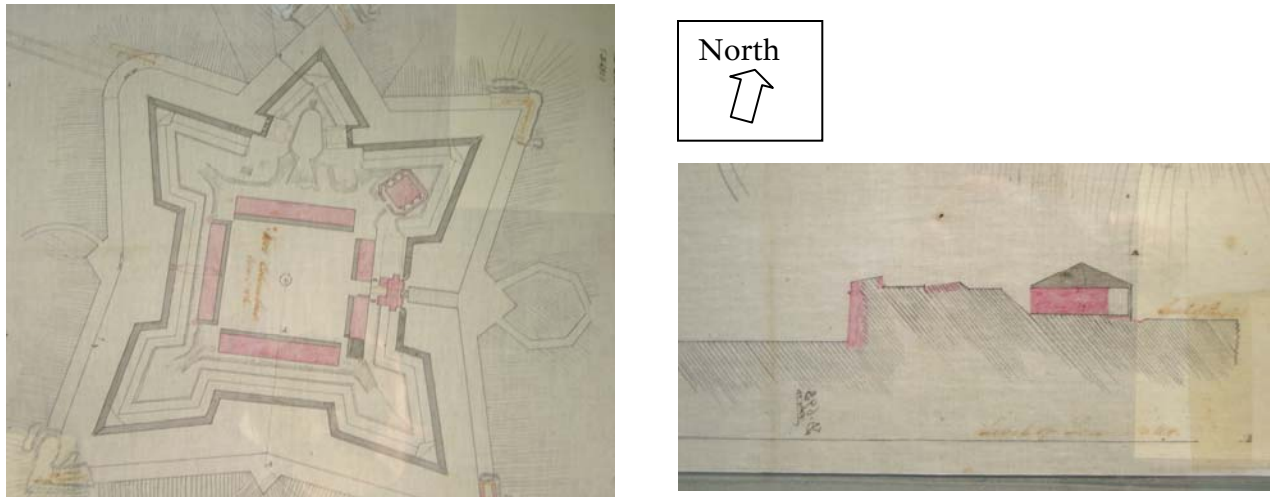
Plan of Fort Columbus (left) and section- elevation through the south barrack (right), 1831.
